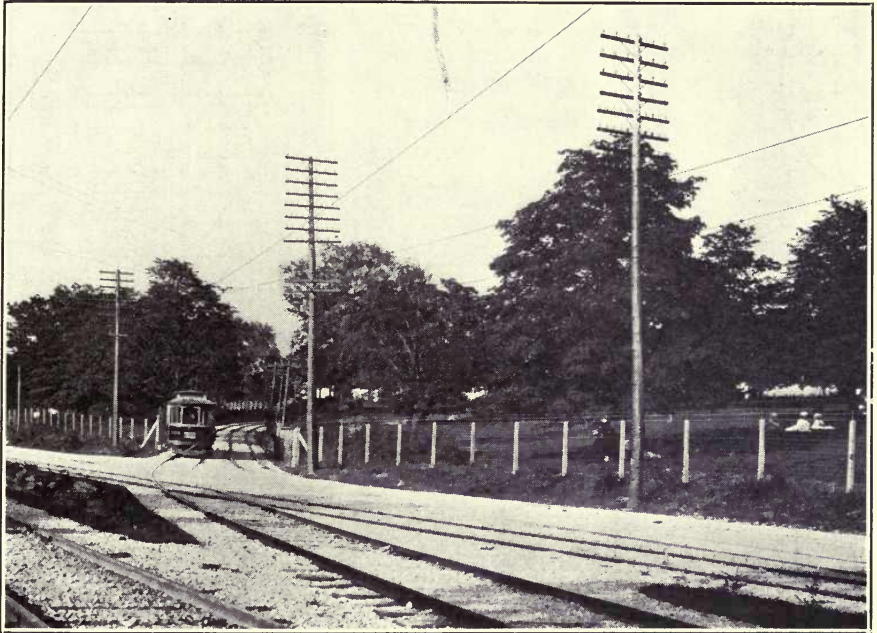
CONCRETE FENCE POSTS, DELLWOOD PARK.
